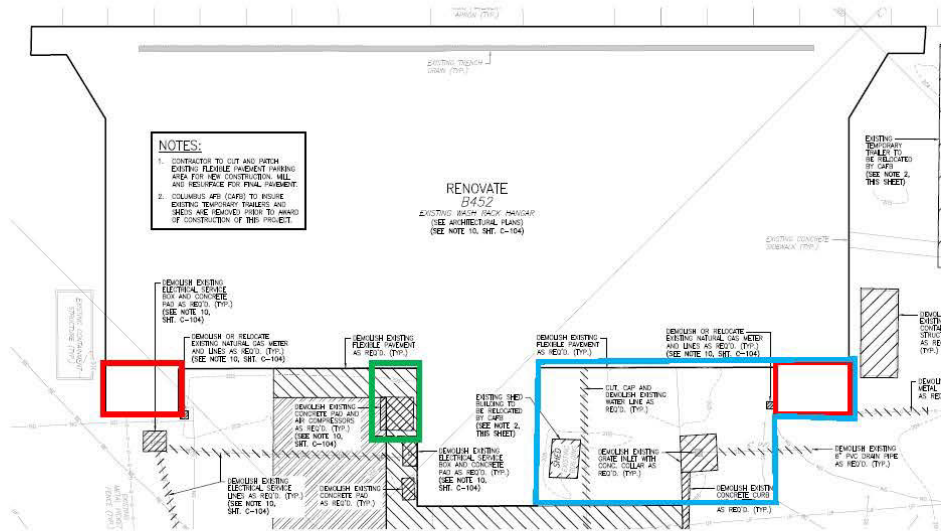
Image showing the current building footprint. The ca. 1980 additions noted in red would be removed, and the location of the new addition is noted in blue. The small stoop and porch indicated in green, which were added ca. 1980, would be reconstructed in-kind with a new concrete stoop and steel canopy with vertical supports.
